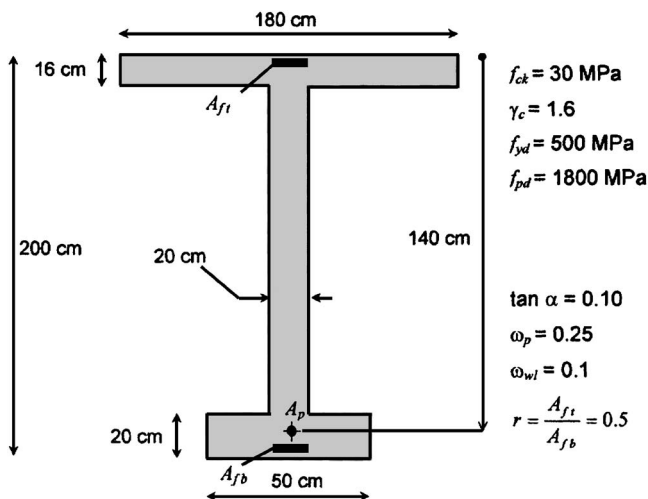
I-shaped cross section of the bridge prestressed concrete beam
